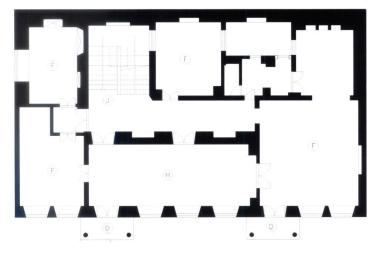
Traditional house plan with Balcony (3rd Type), Lalei House [4]
